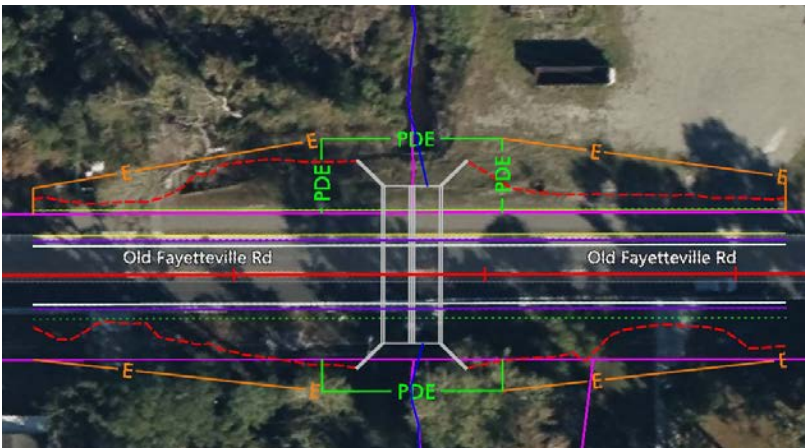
Old Fayetteville Road Proposed Culvert Replacement Project
